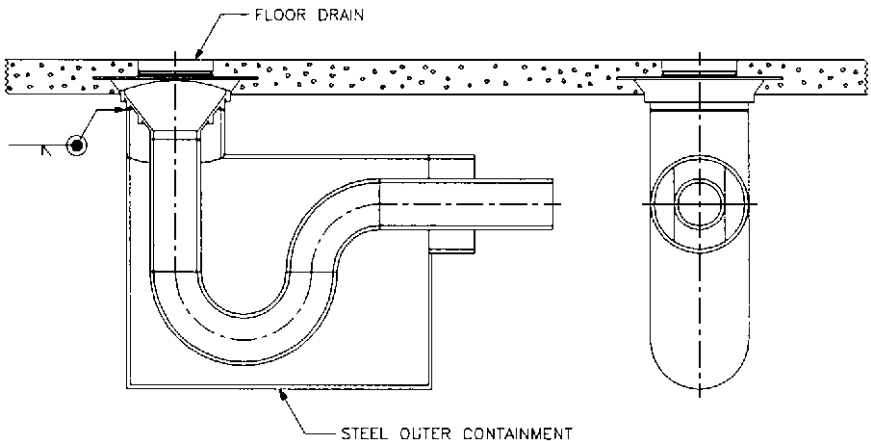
Fabricated double containment P-trap incorporating a cleanout, where the system uses metallic or thermoplastic butt welding/fusion pattern pressure fittings as the basis to fabricate a non-plumbing-code approved drainage system.
